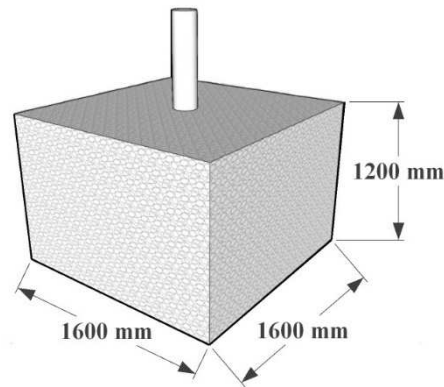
Three-dimensional view of the model containing soil and penetrating pile.
